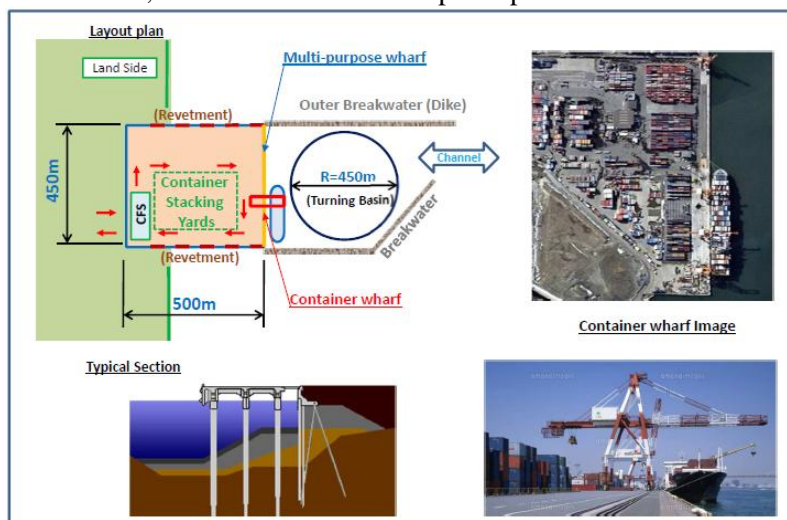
Conceptual Plan of New Bluefields Port and its Image
